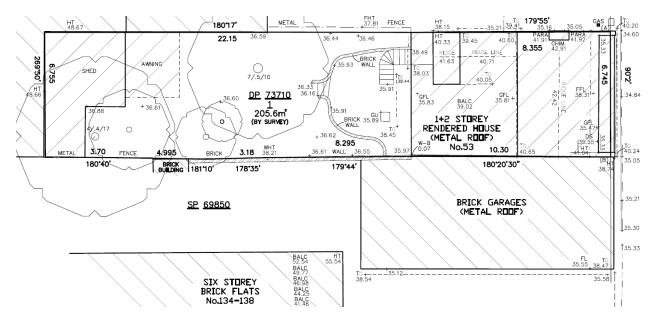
Boundary survey, showing subject site and adjoining property at 134-138 Redfern Street
